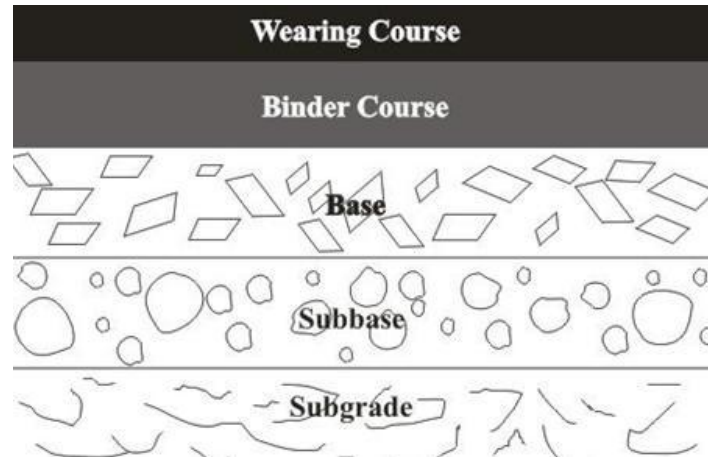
Basic Flexible Pavement Structure (Source [1])
